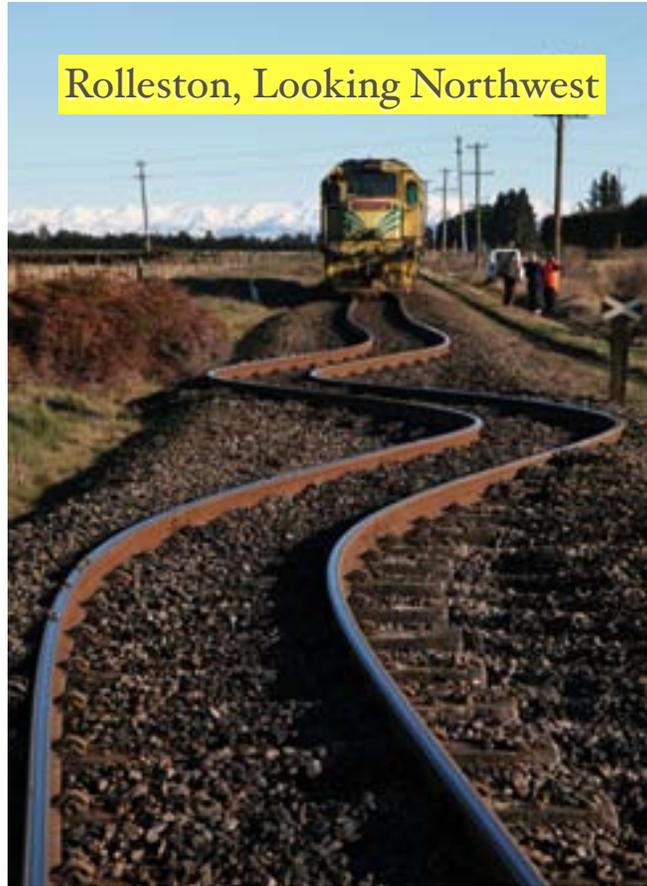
Buckling of Rails at Fault Offset Location (Baxter)
